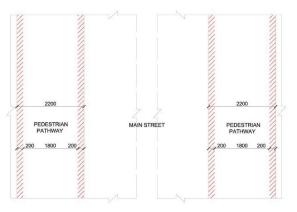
Street width and buffer spaces (in mm) for Gateway 4 in the area surrounding Offenbach am Main Hauptbahnhof
